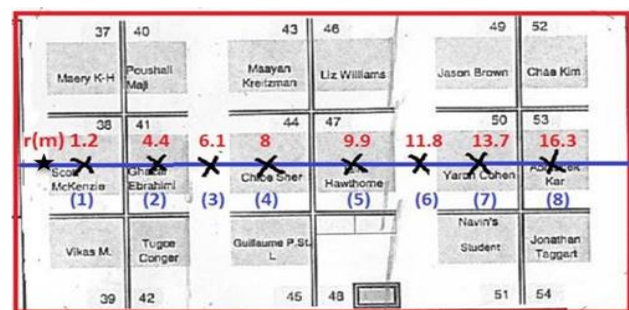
Photo of DL2 (★) source and (X) receiver positions in AERL floor plan.
